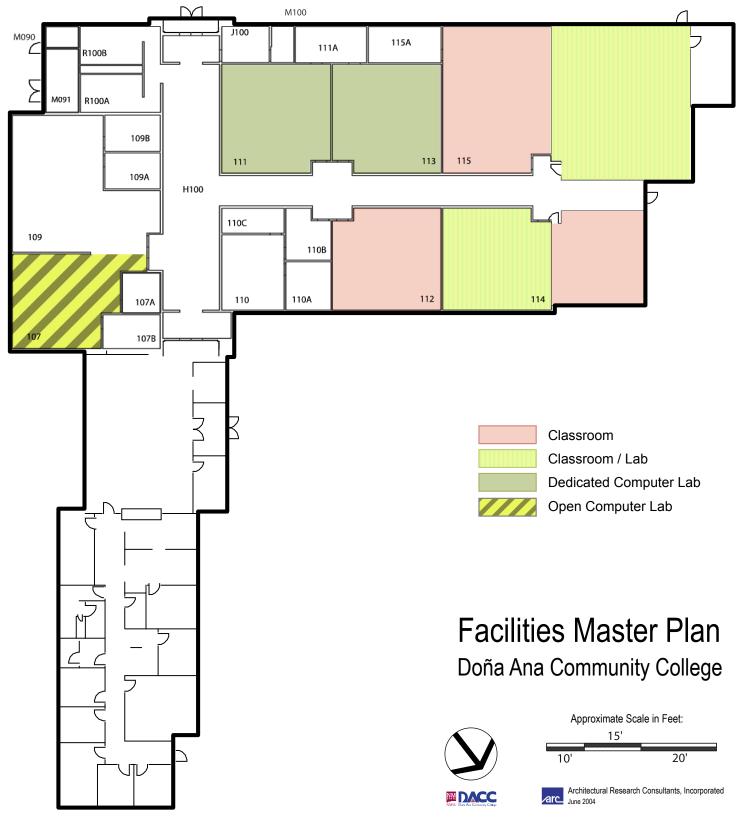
Existing Instructional Use, Sunland Park Center
